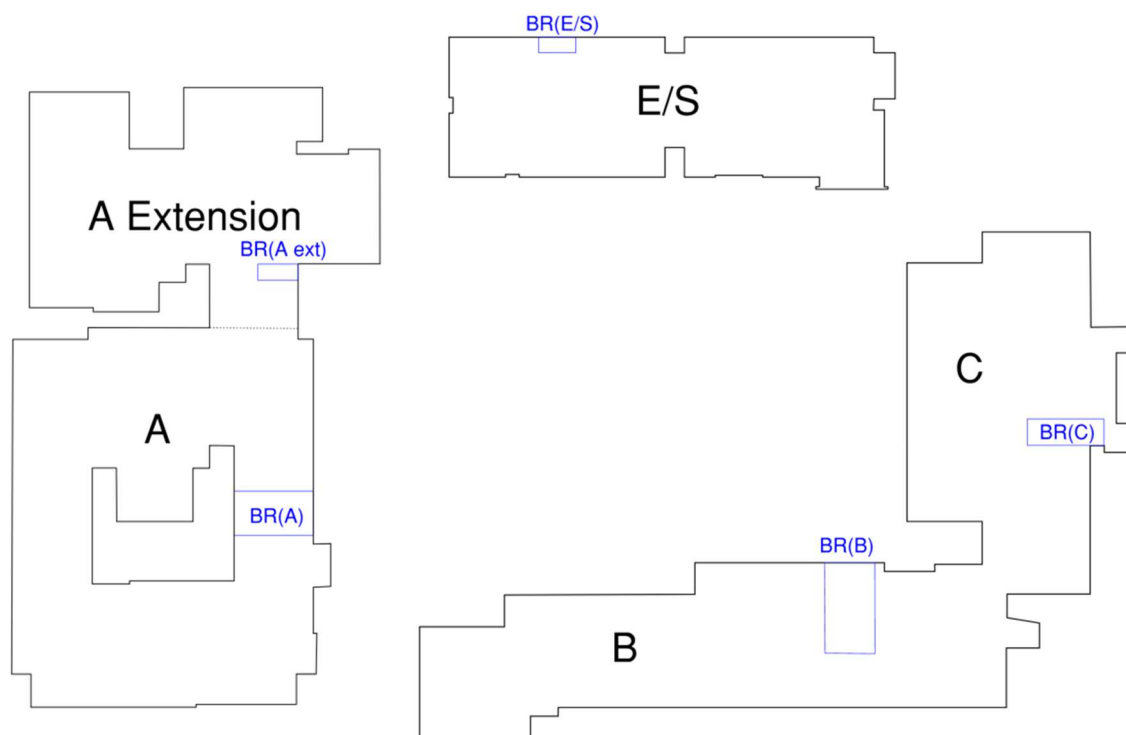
Ground floor Block plan with boiler rooms highlighted in blue.
